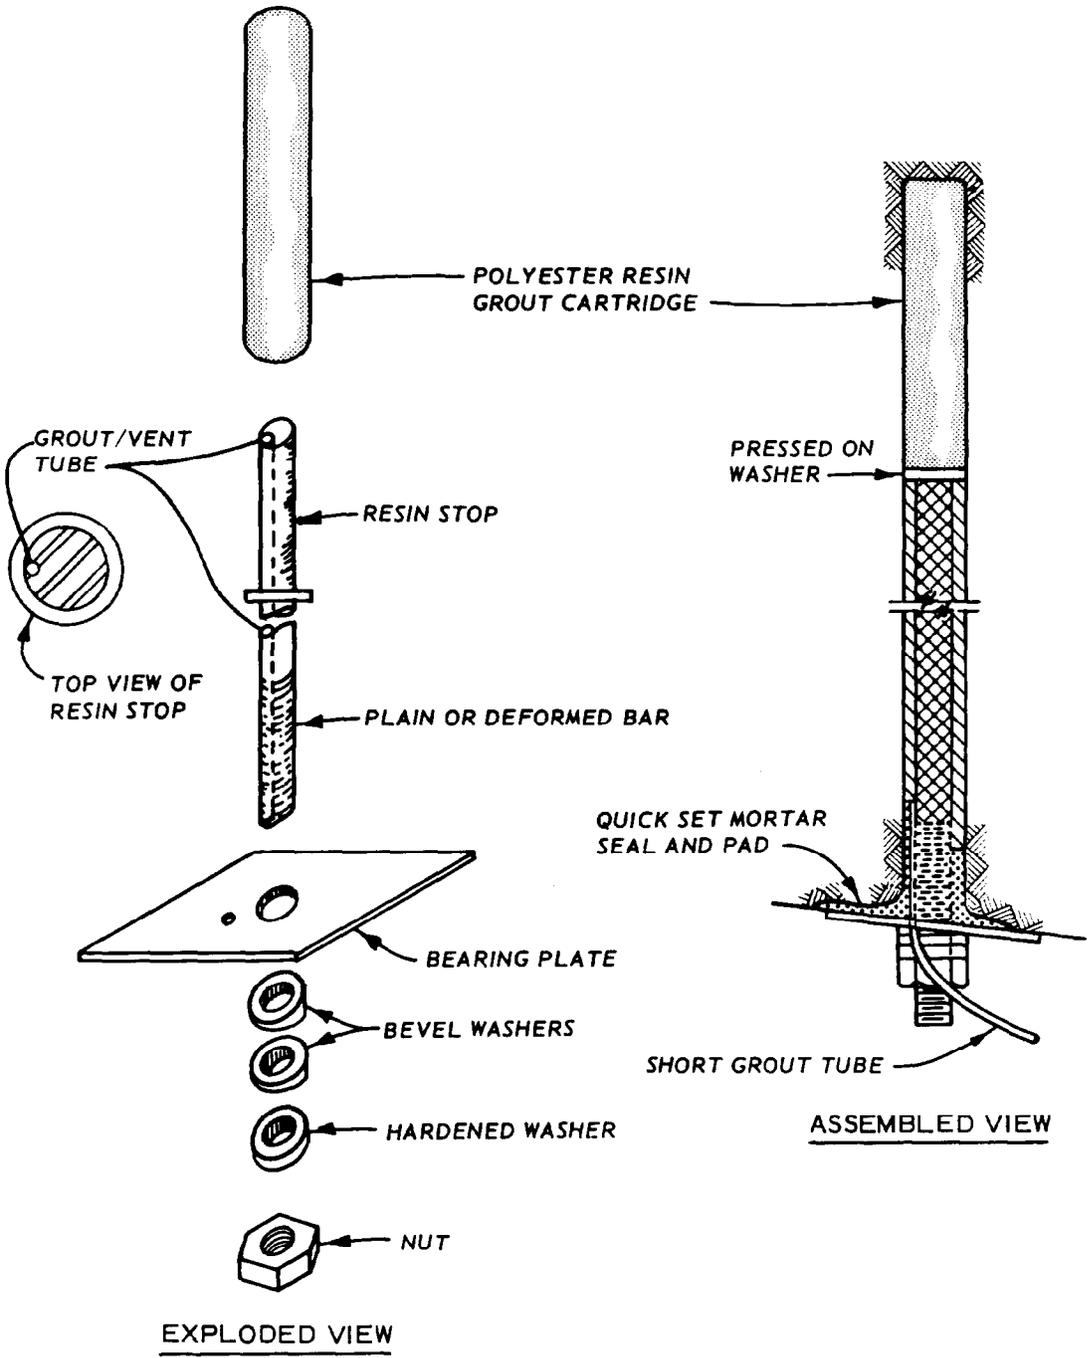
Cement groutable rock bolt with resin anchor stop and integral grout tube.
